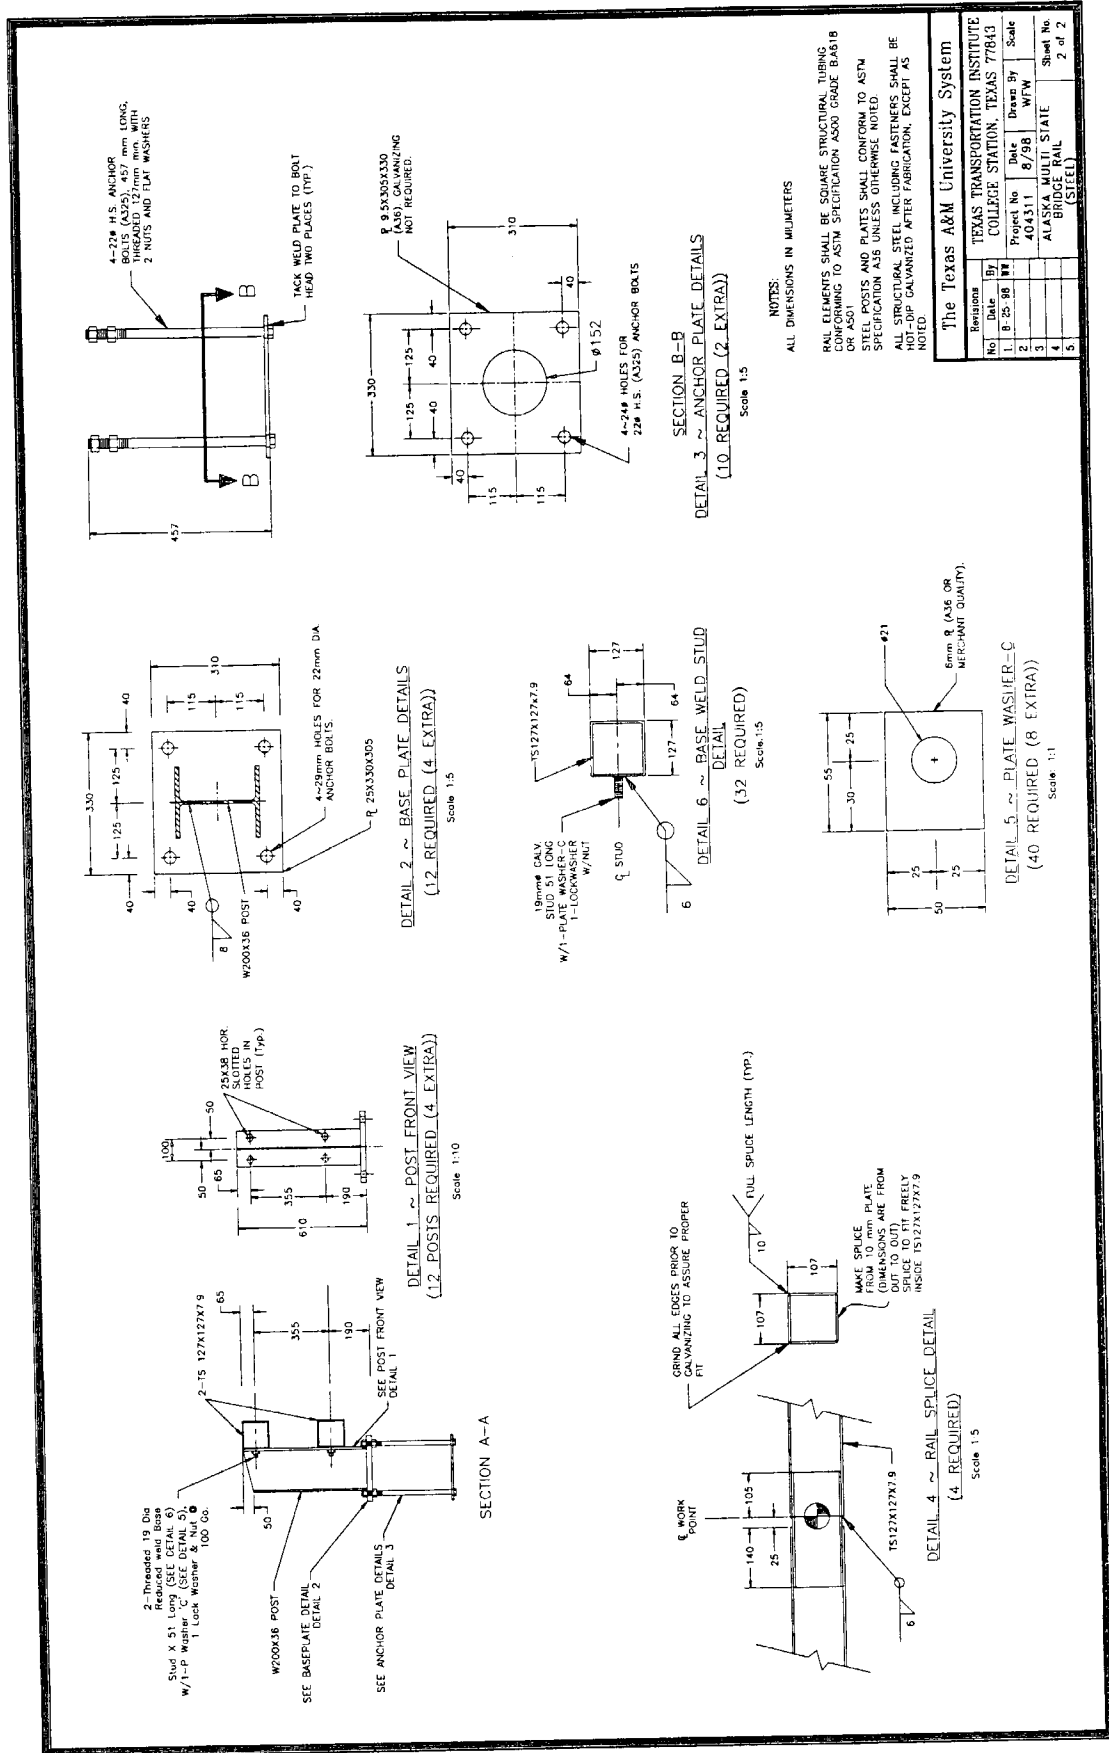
Details of the Alaska Multi-State Bridge Railing mounted on the curb (steel) (continued).
